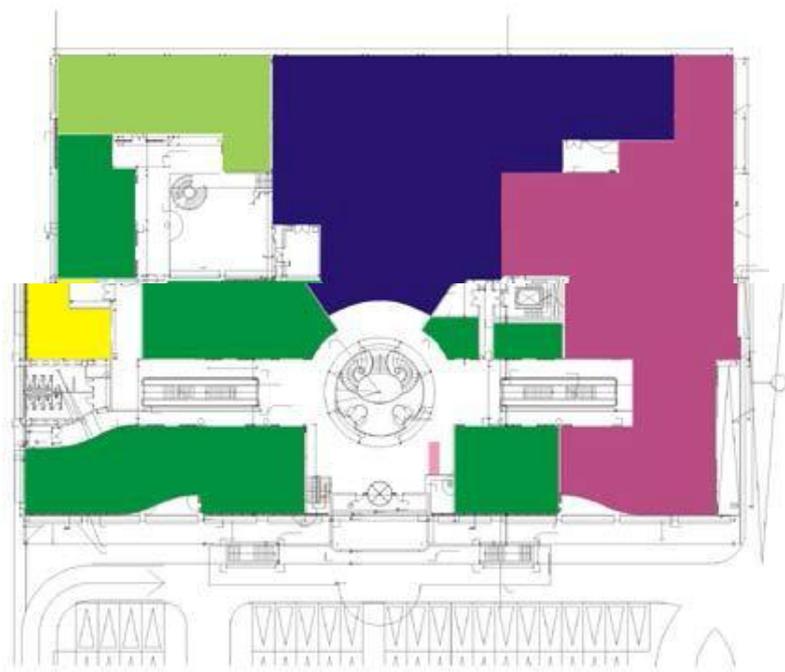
Ground floor Plan of Ceddi Plaza, Abuja.
